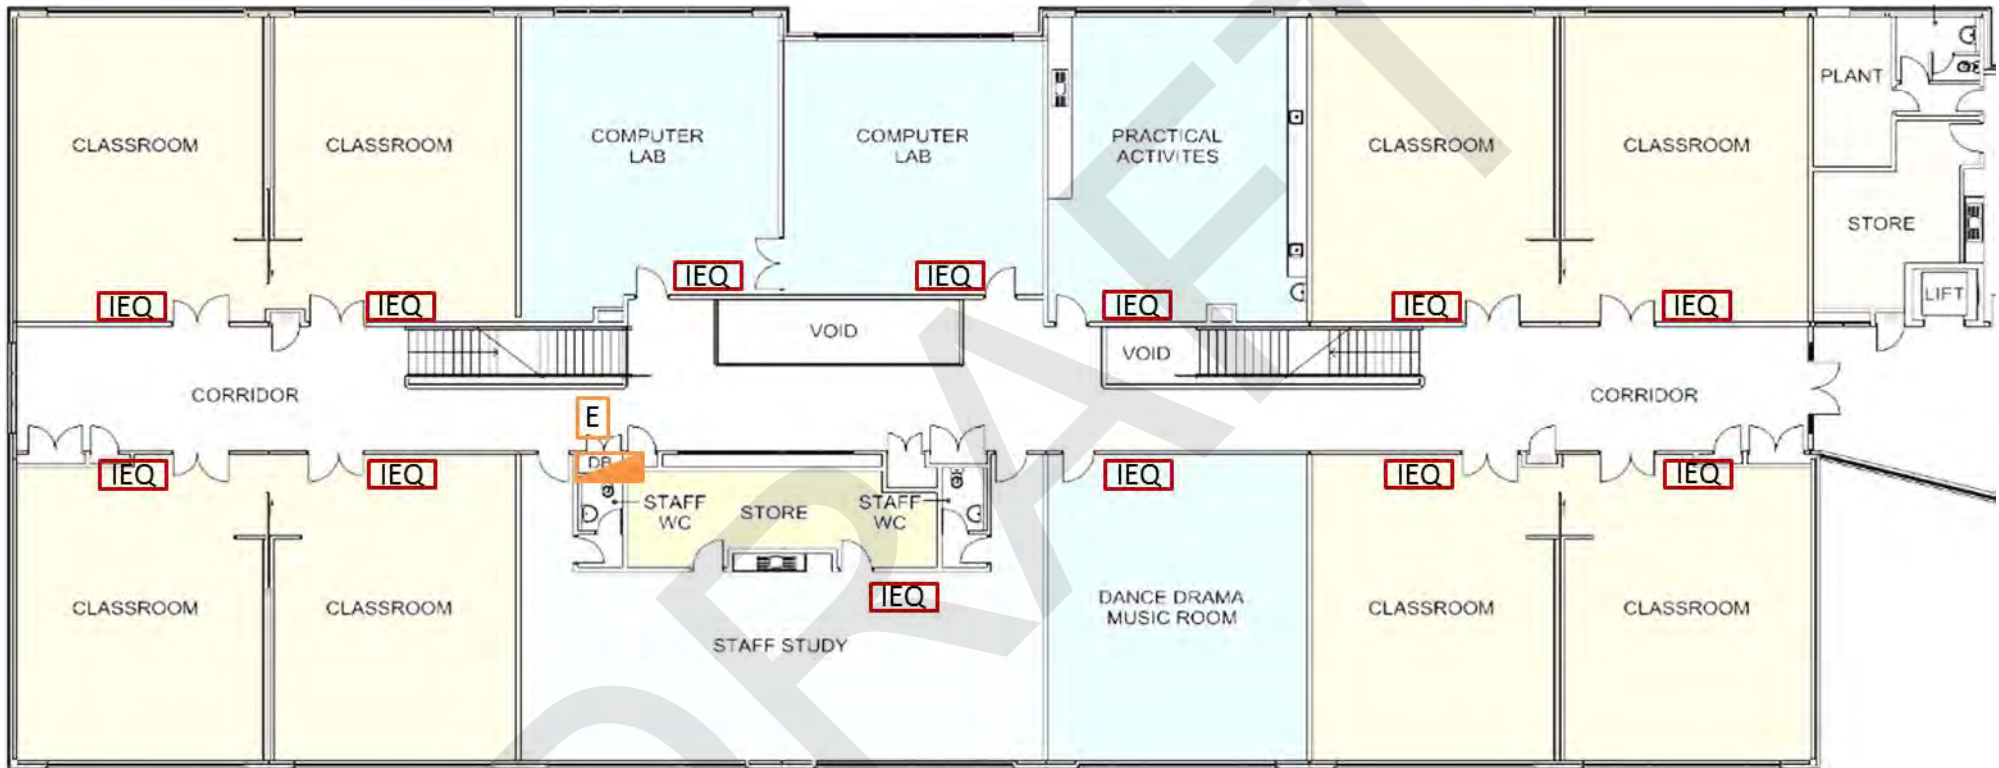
B08 - High school – years 6 to 8 first floor west -- monitoring layout.
